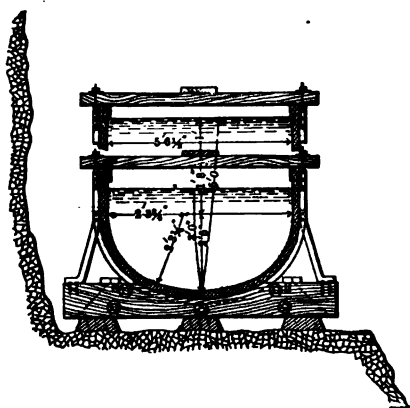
Cross-section of Stave and Binder Flume, Santa Ana Canal.
